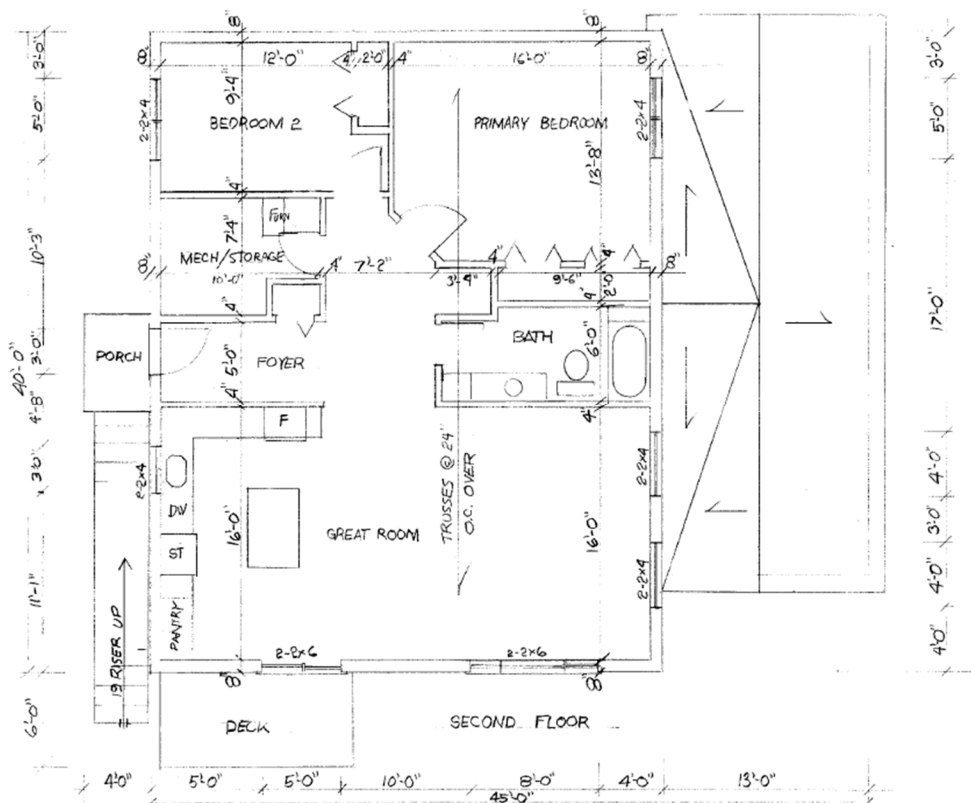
Proposed Second Storey Floor Plan of the detached ARDU
